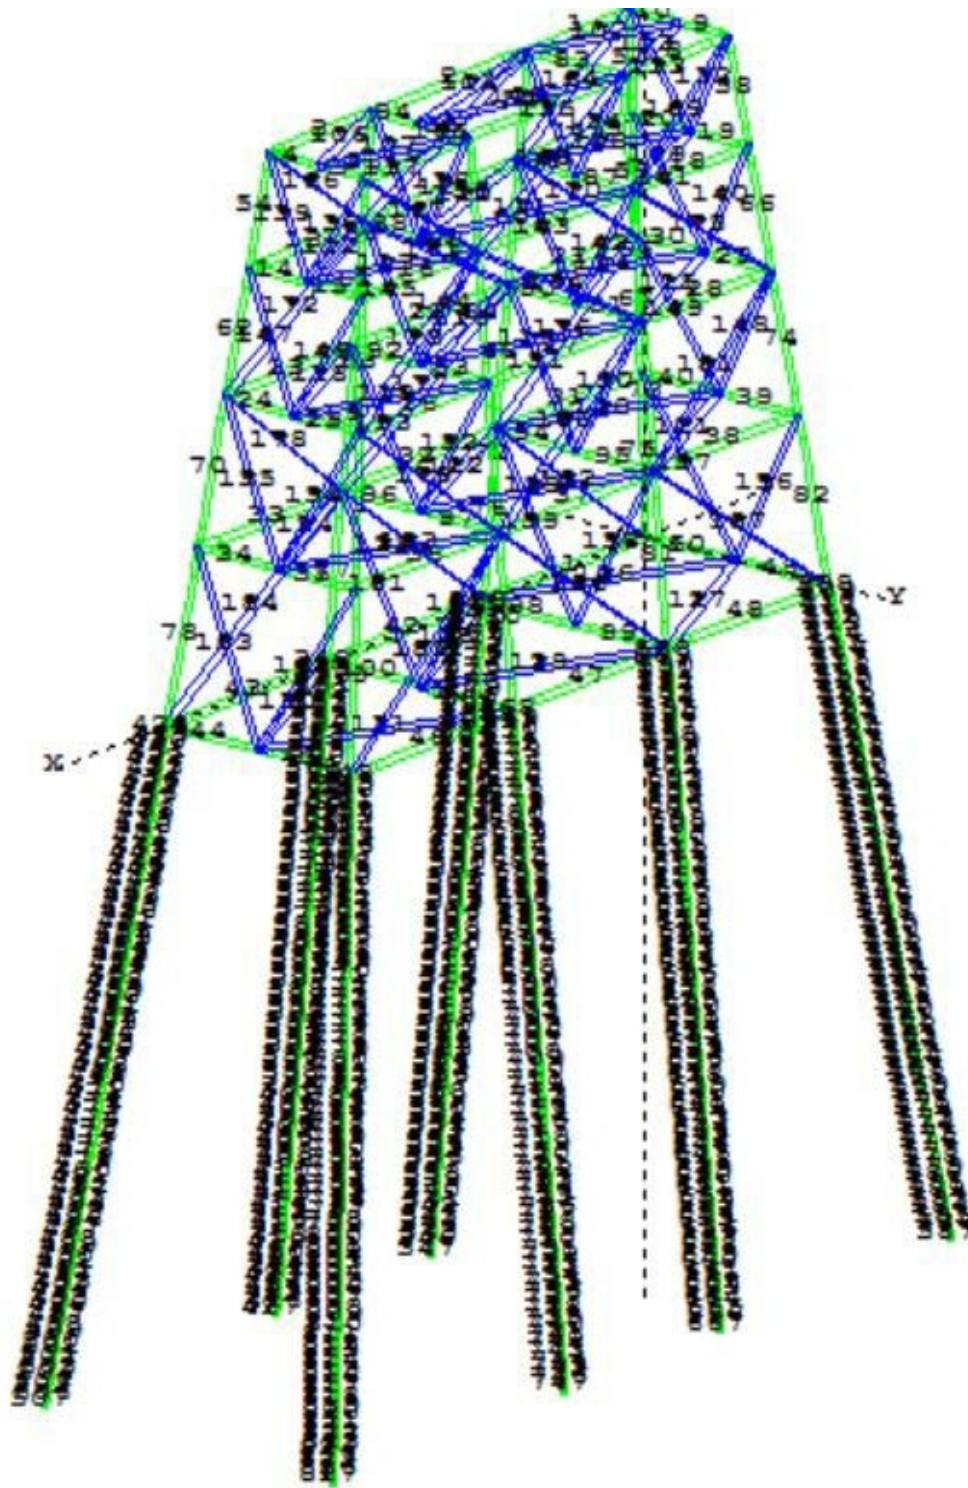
Three-dimensional view of a jacket platform based on deformable soil (soil–pile–platform system).
